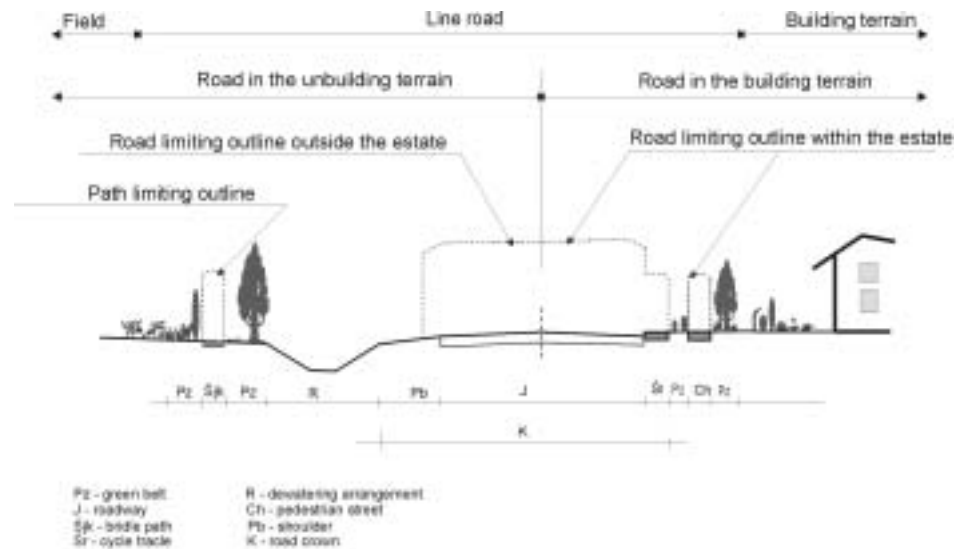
Suggested cross-section design of rural road within the area of protected landscape.
